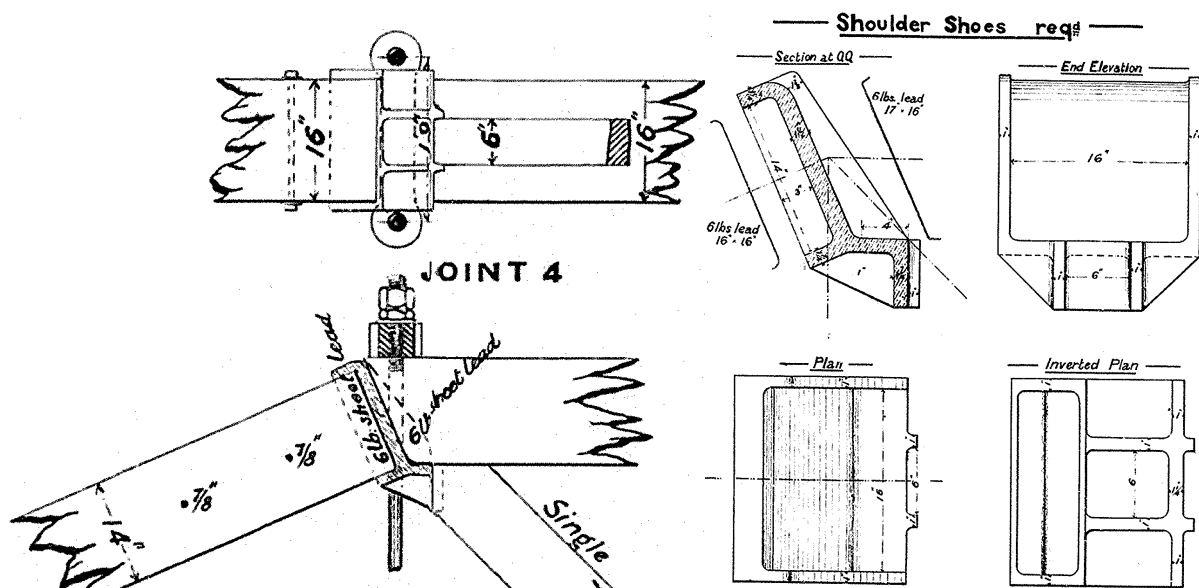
Plan of Cast Iron Shoe at top of Principal in 90° McDonald Truss at Tarraganda
